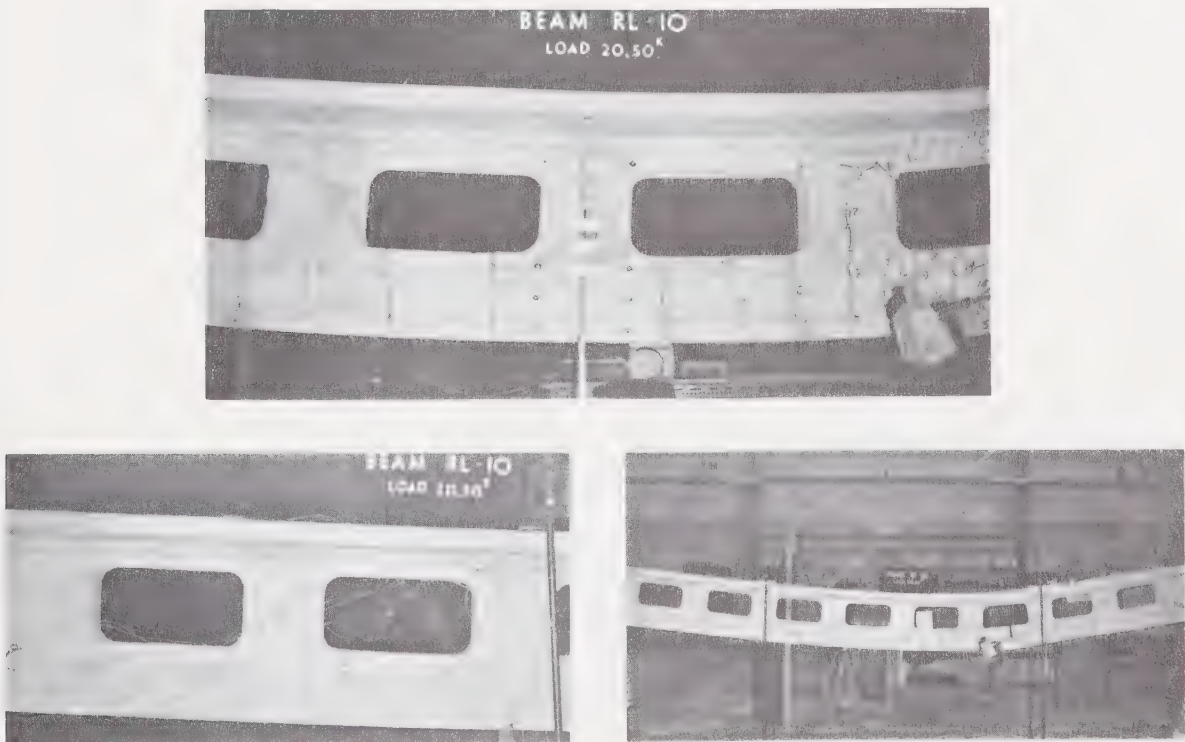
CRACKING AND FAILURE PATTERN OF BEAM 10-16-6
